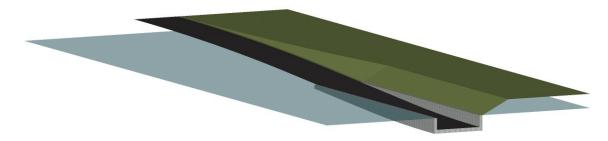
Open tunnel section adapted to a lower maximum groundwater level (SketchUp).
